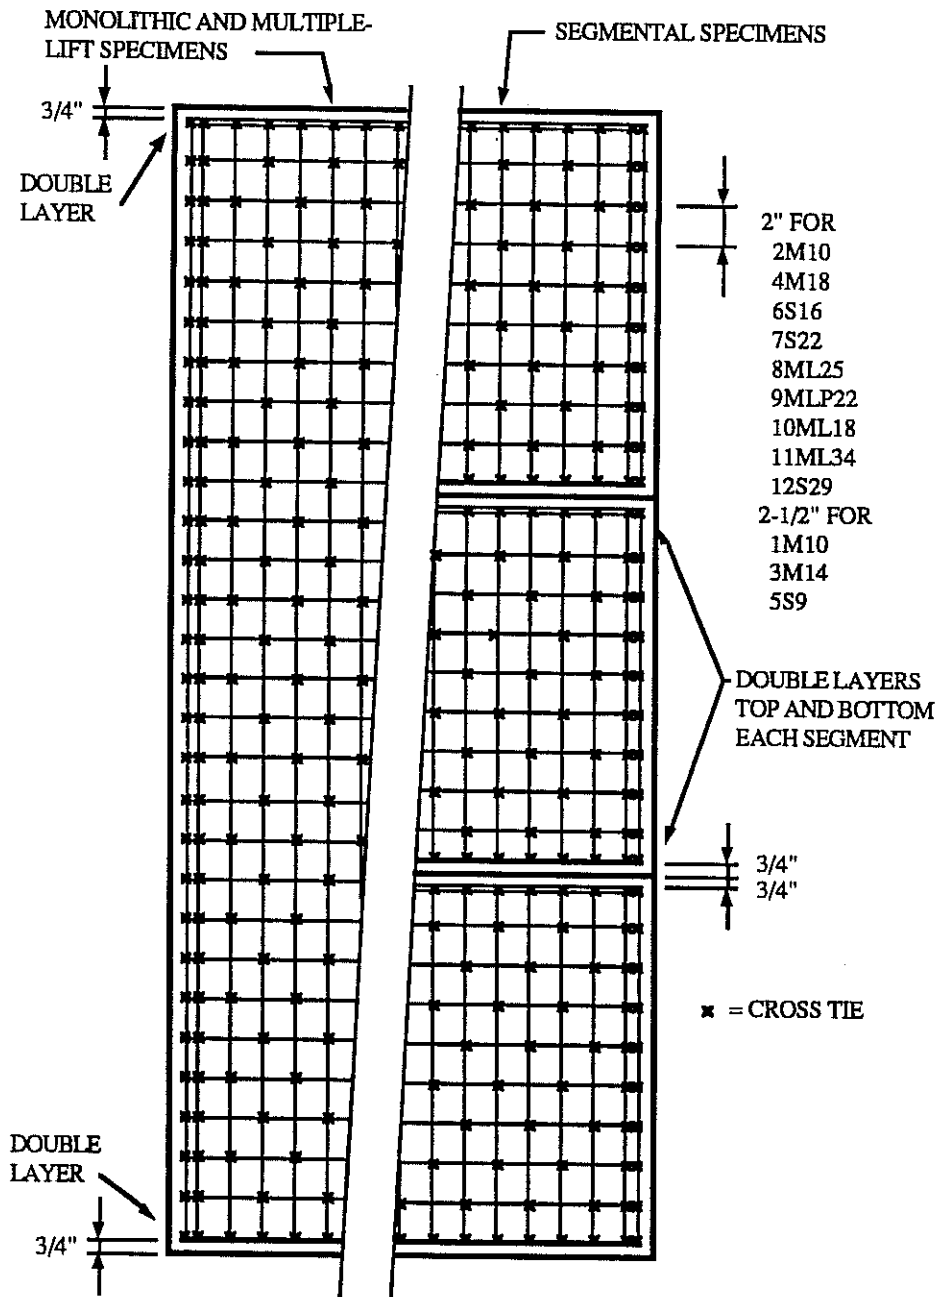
Spacing of Lateral Reinforcement and Cross Ties in Test Specimens
